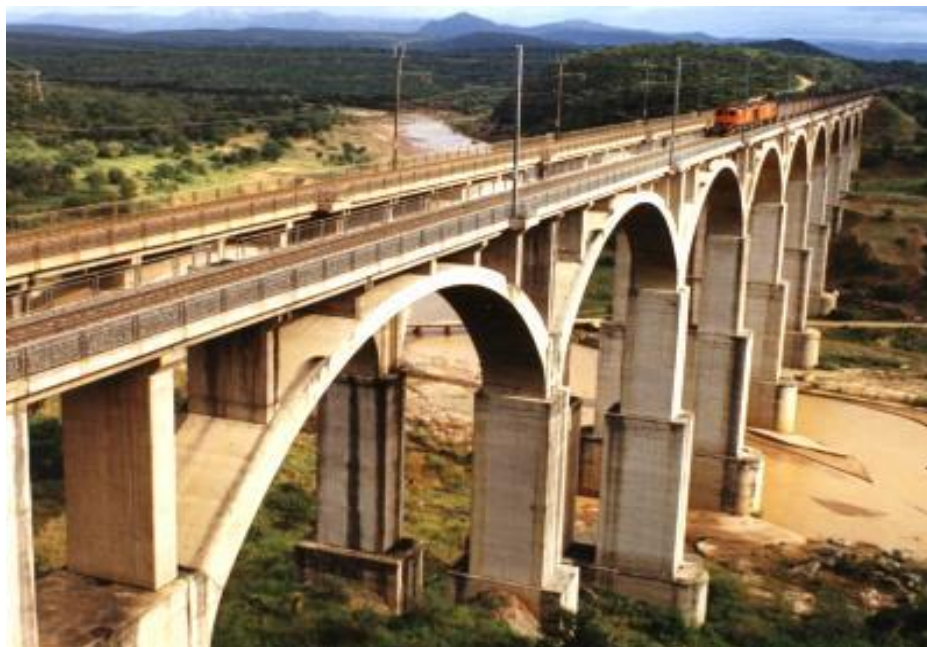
uMfolozi River Rail bridge (Source: <http://www.railwaygazette.com>, 2013)
